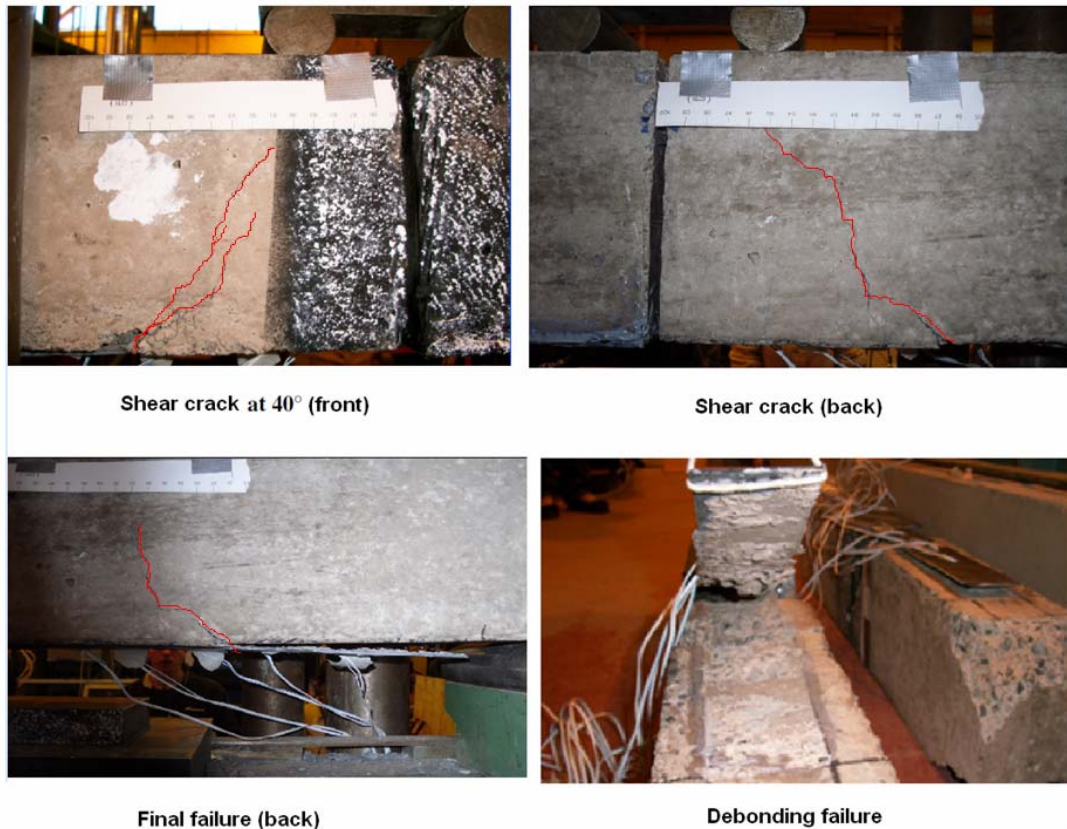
Failure mode of Specimen 1 under static 4-point bending test
